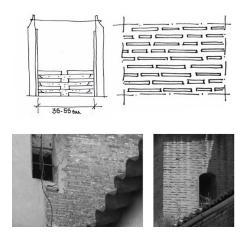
Details of Type IV-wall. Elevation of the Farmhouse of Falco, Godella; Elevation of Saint Ursula Church, Valencia (authors).
